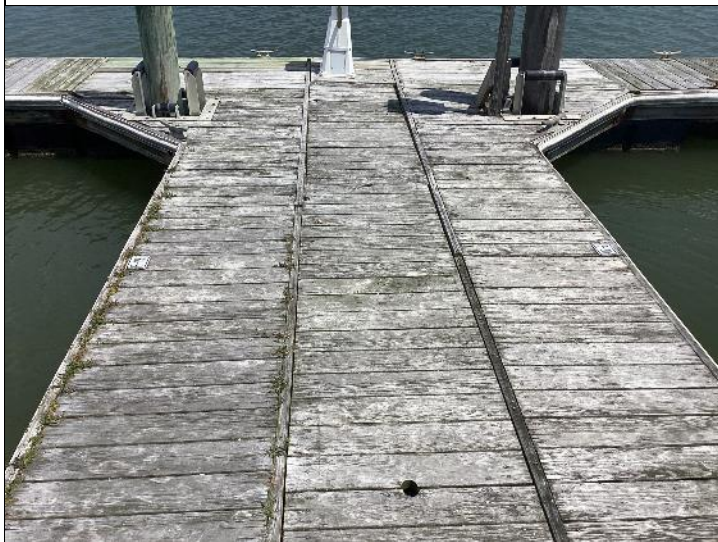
Deterioration noted in the dock decking. This can be sectionally repaired overtime or replaced all at once.
